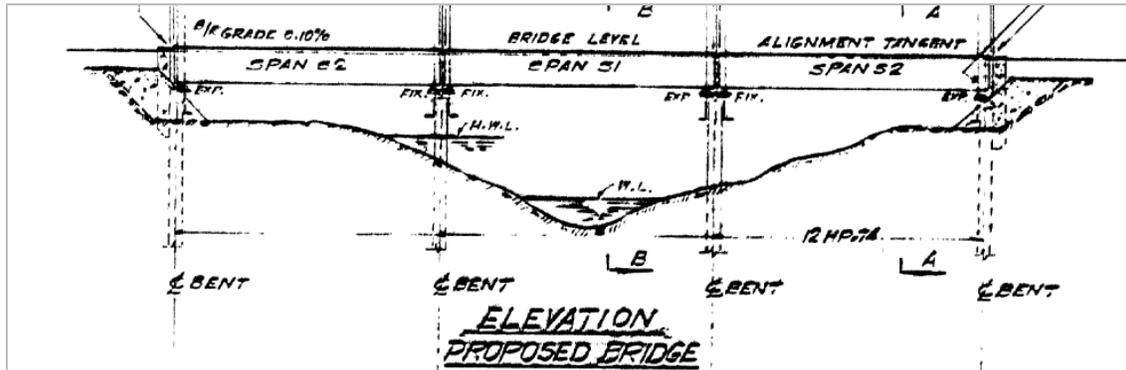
Elevation view of the PK 118.8 Chapais bridge
